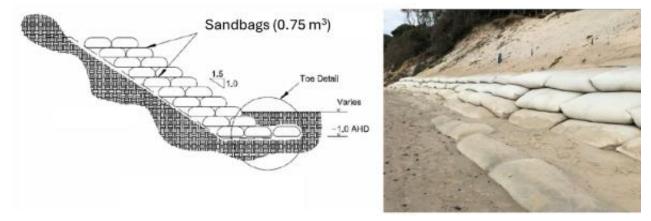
Sandbag revetment wall – left: typical cross-section (revetment height varies, adapted from Coghlan *et al.* (2009)), right: sandbag revetment wall at Clarkes Beach, Byron Bay (image: J. Carley)
